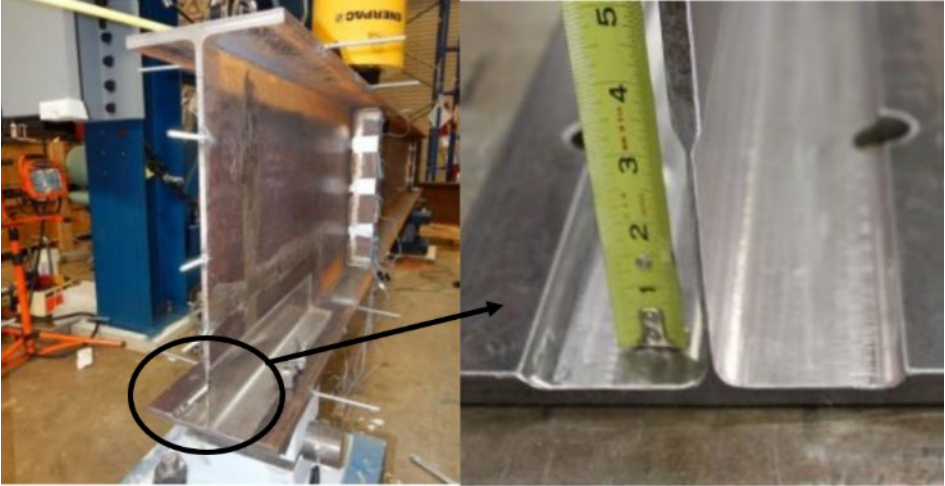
Damaged girder end (Zmetra 2015)
